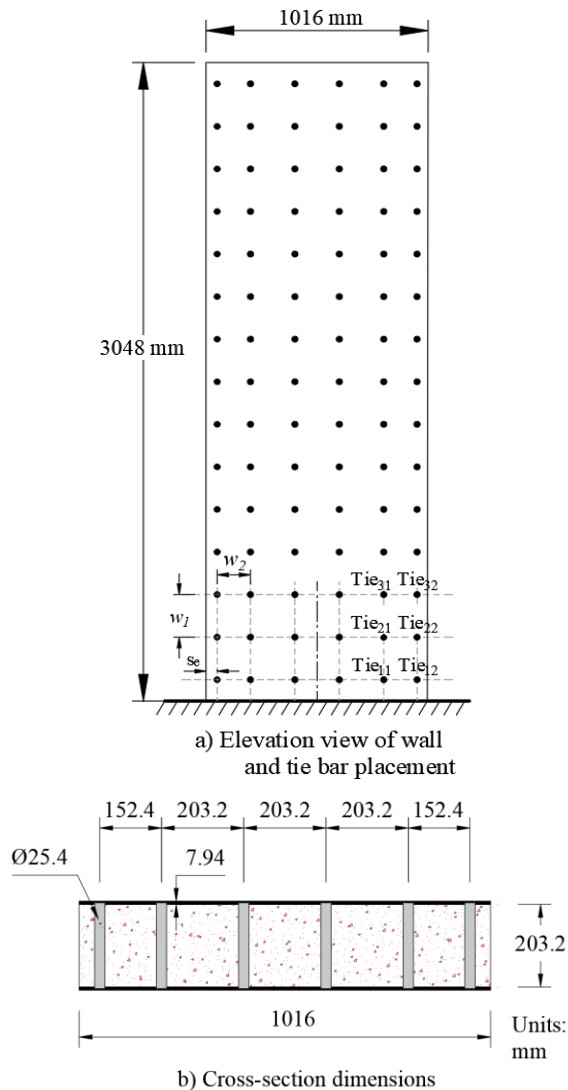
Dimensions of Model NB in: (a) Elevation view of wall and tie bar placement; and (b) Cross-section.
